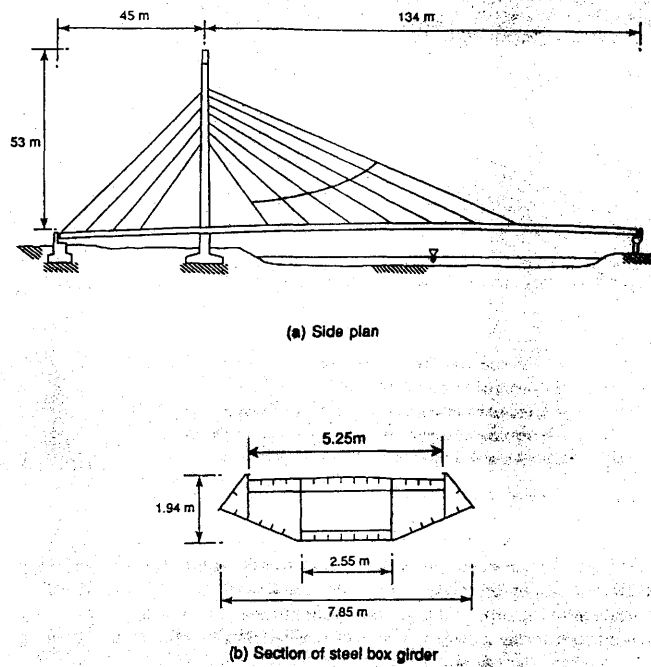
A pedestrian cable-stayed bridge (a) side plan; (b) section of steel box girder [7]
